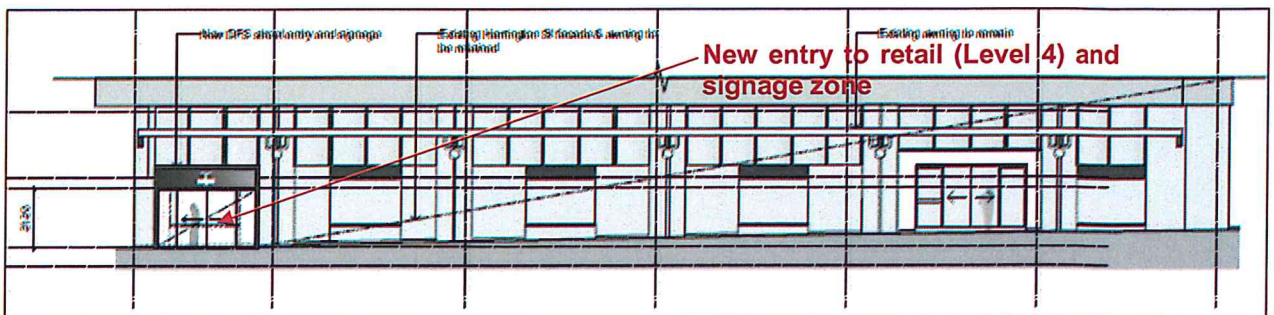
Harrington Street elevation- new retail entrance from Street to Level 4 (Source: pmdl)
